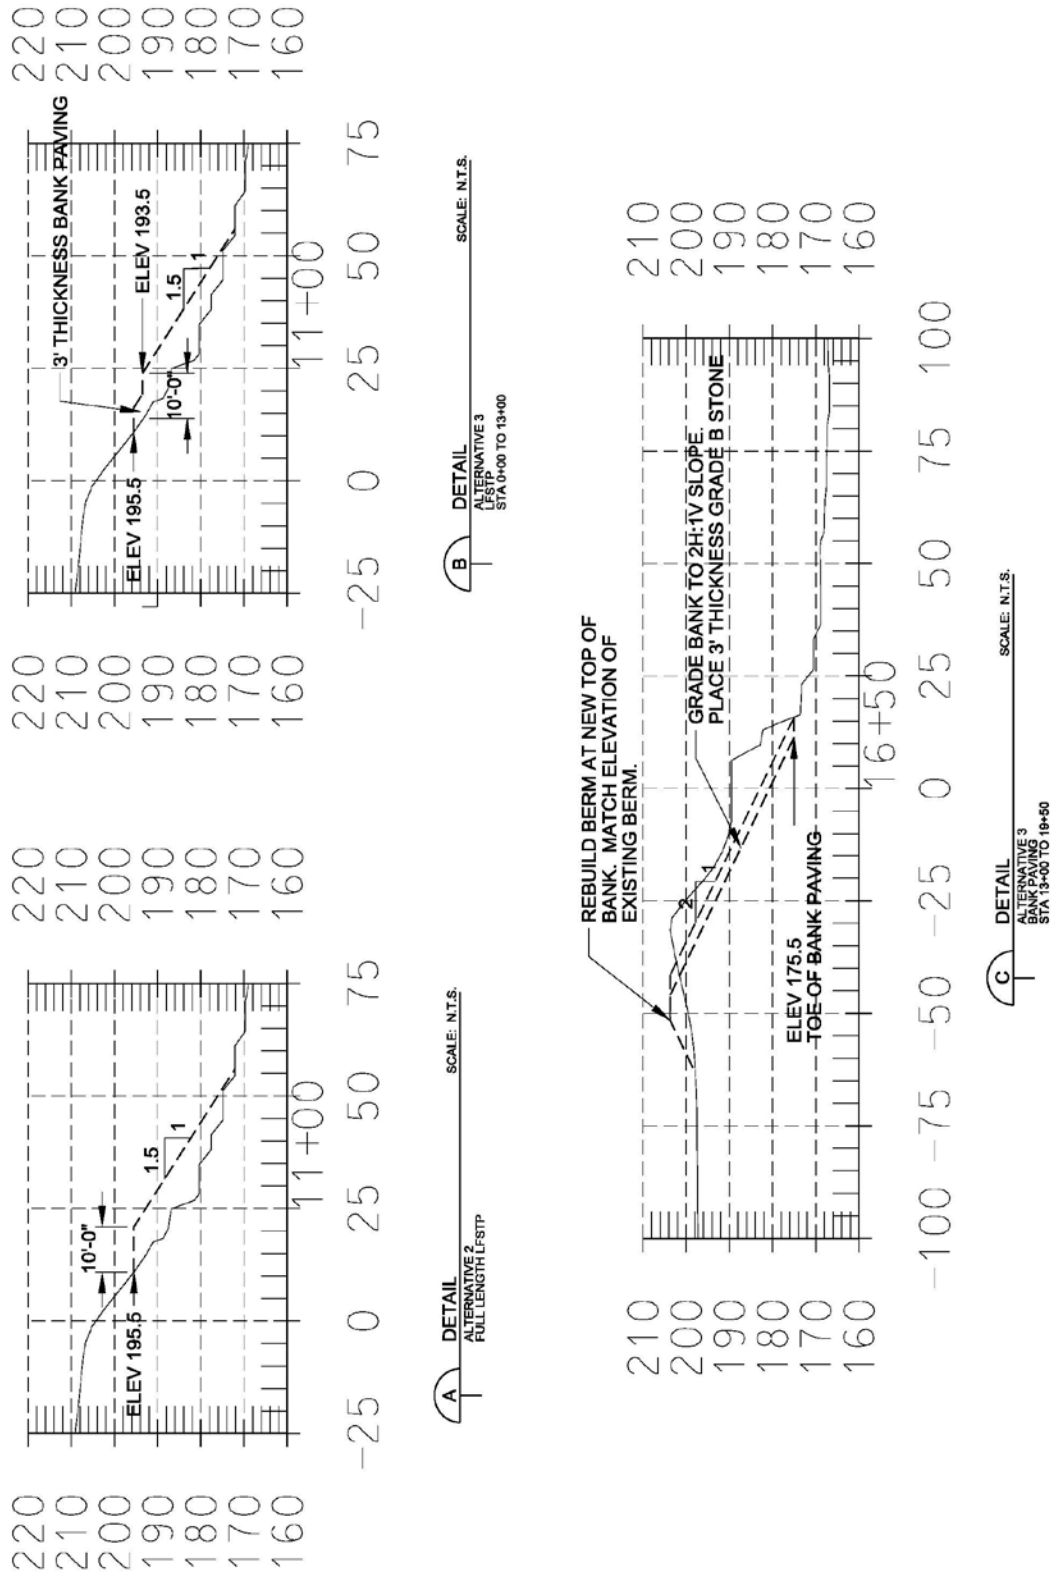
Typical Cross Sections of Alternative 2 (detail A) and Alternative 3 (detail B and C).
